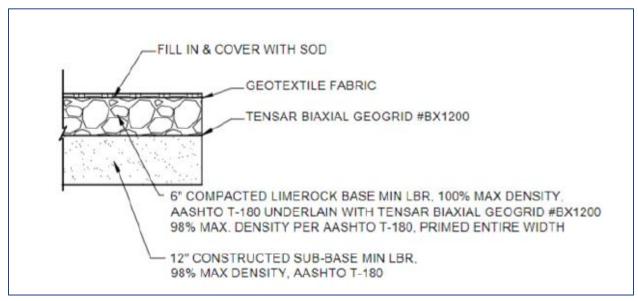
| Example Emergency Access Driveway Stabilization Detail
